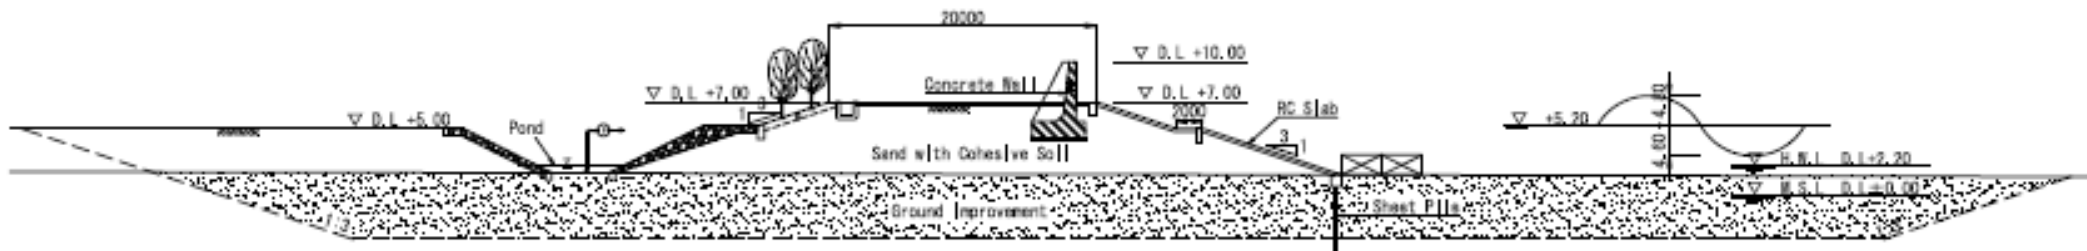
Case2 Typical Section of Embankment Type
